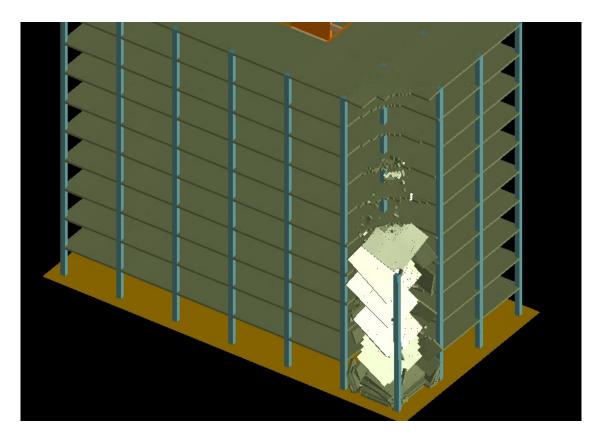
Corner column removed in a 10-storey building of span ratio 1. (at second 4.20 of the analysis)
